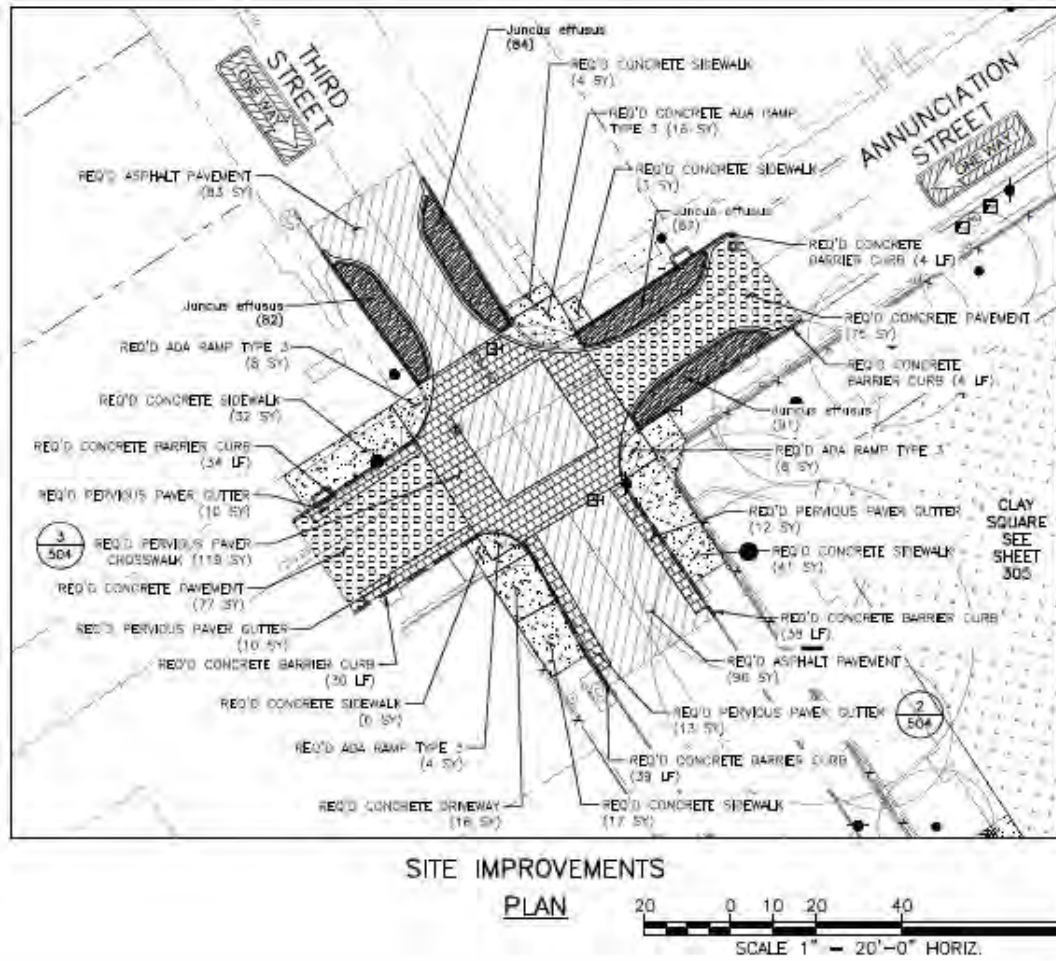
Proposed plan of intersection at Annunciation St. and Third St.
